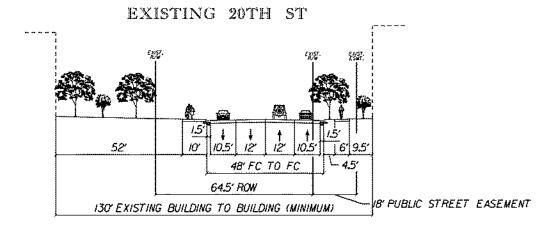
Existing 20th Street S Cross Section (looking east toward Route 1)
